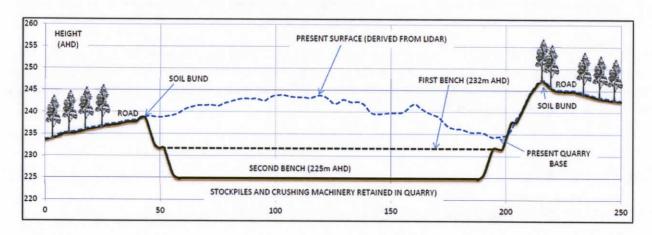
Cross-section of quarry extraction plan for the existing pit (Figure 2-2-4b of the DPEMP).
